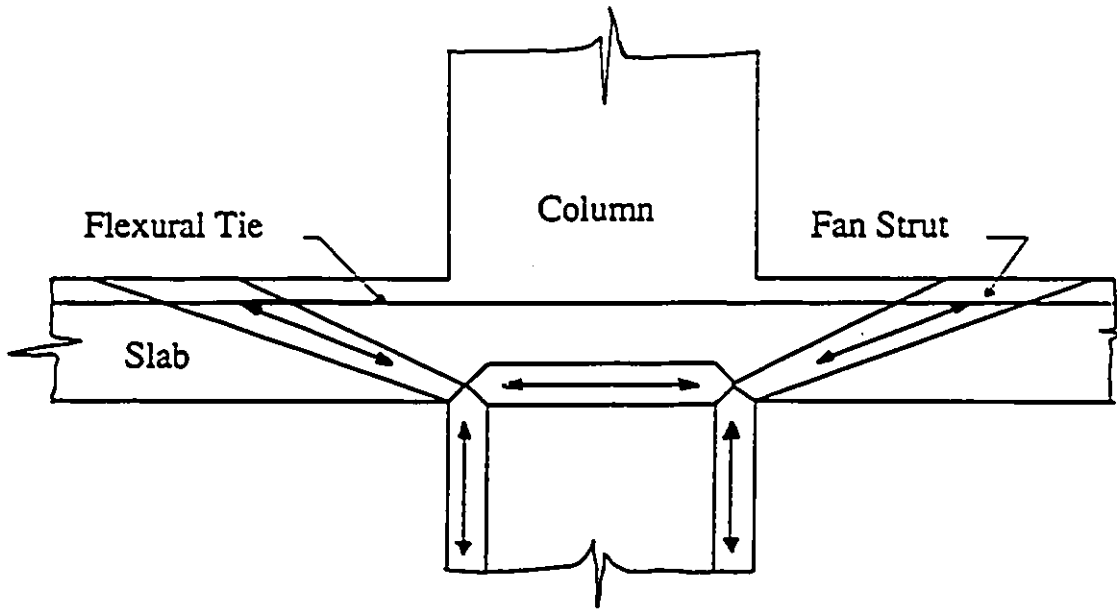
Out-of-plane struts in an interior column-slab connection
